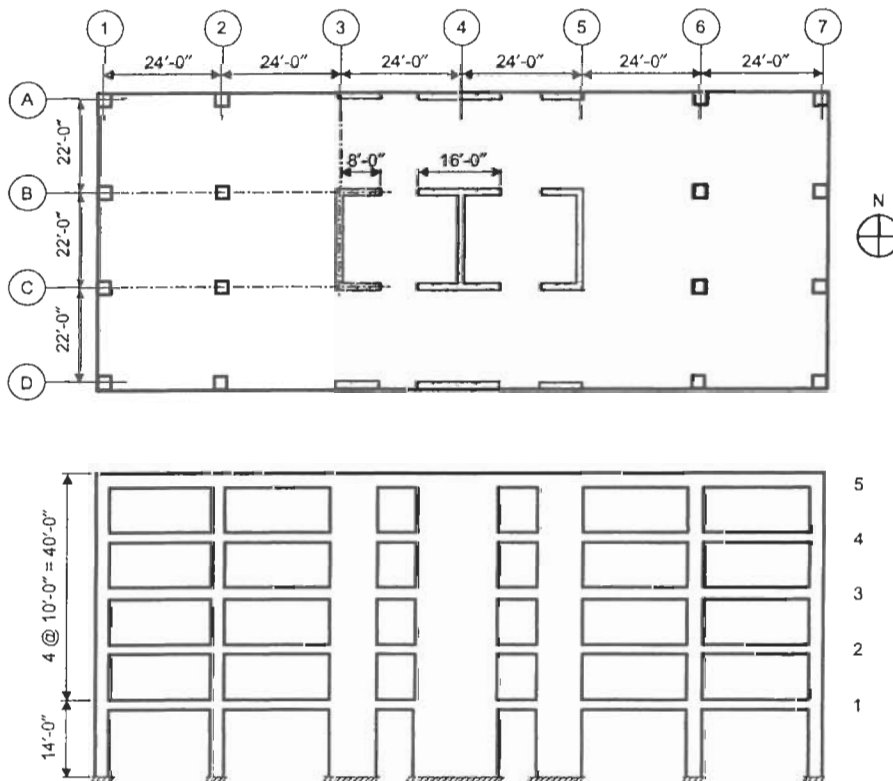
Typical Plan and Elevation of Example Building (SDC D)
